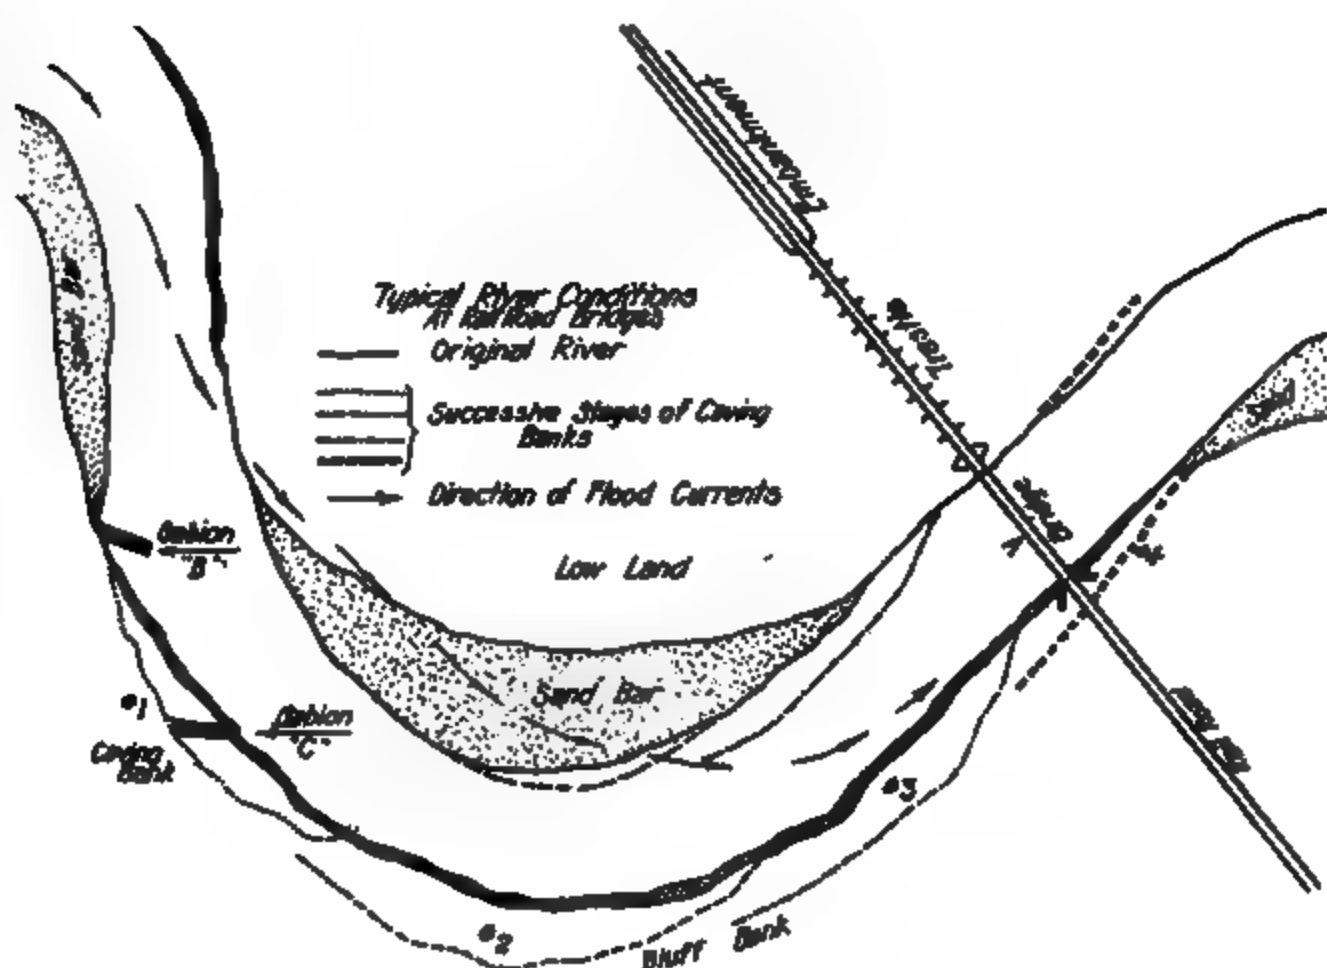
Typical River Conditions and Means of Protection of Bridge.
